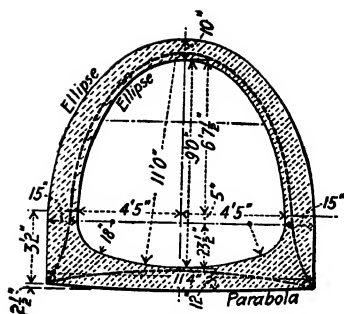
Louisville, Ky., Southern Outfall Sewer, Sec. E, Contract No. 14, 1909, J. B. F. Breed, Chief Engineer. Semielliptical section, 12 ft. 3 in. Average cover about 21 ft. Material excavated, sand and gravel overlaid with considerable alluvial clay; no groundwater.
